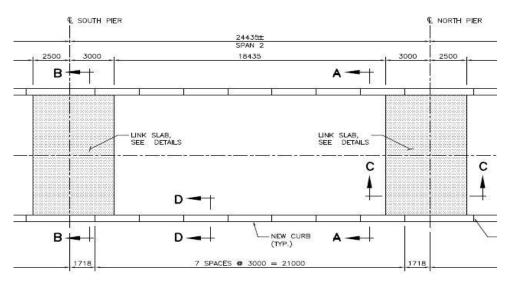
Debonded areas of the Deck at Link Slab Locations.
